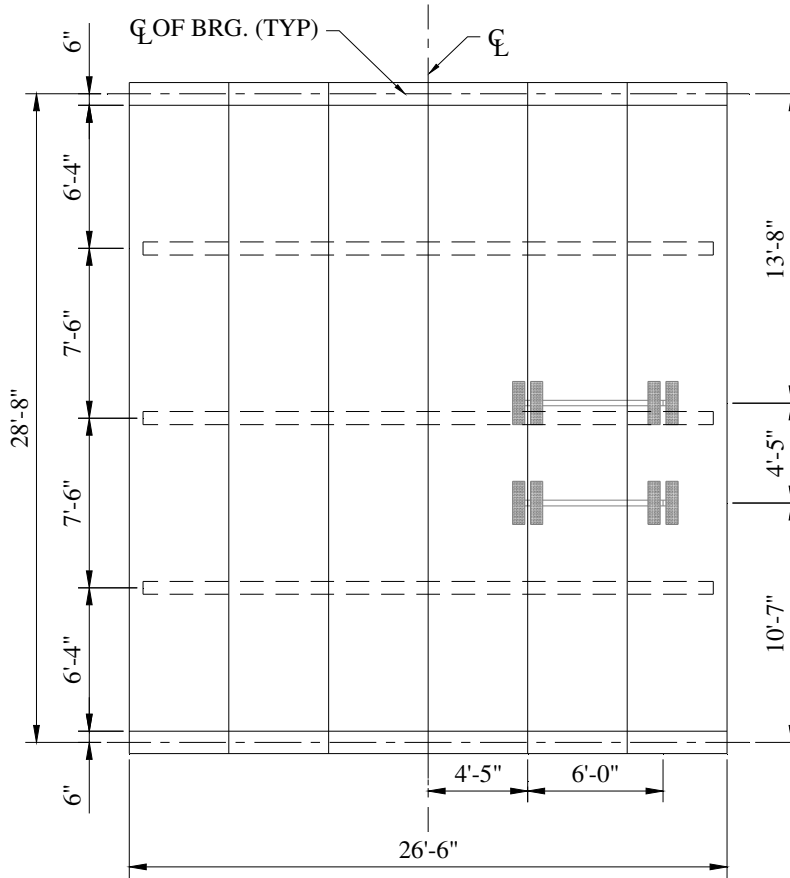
Controlling Load Position for Bolivar Bridge, Plan View
